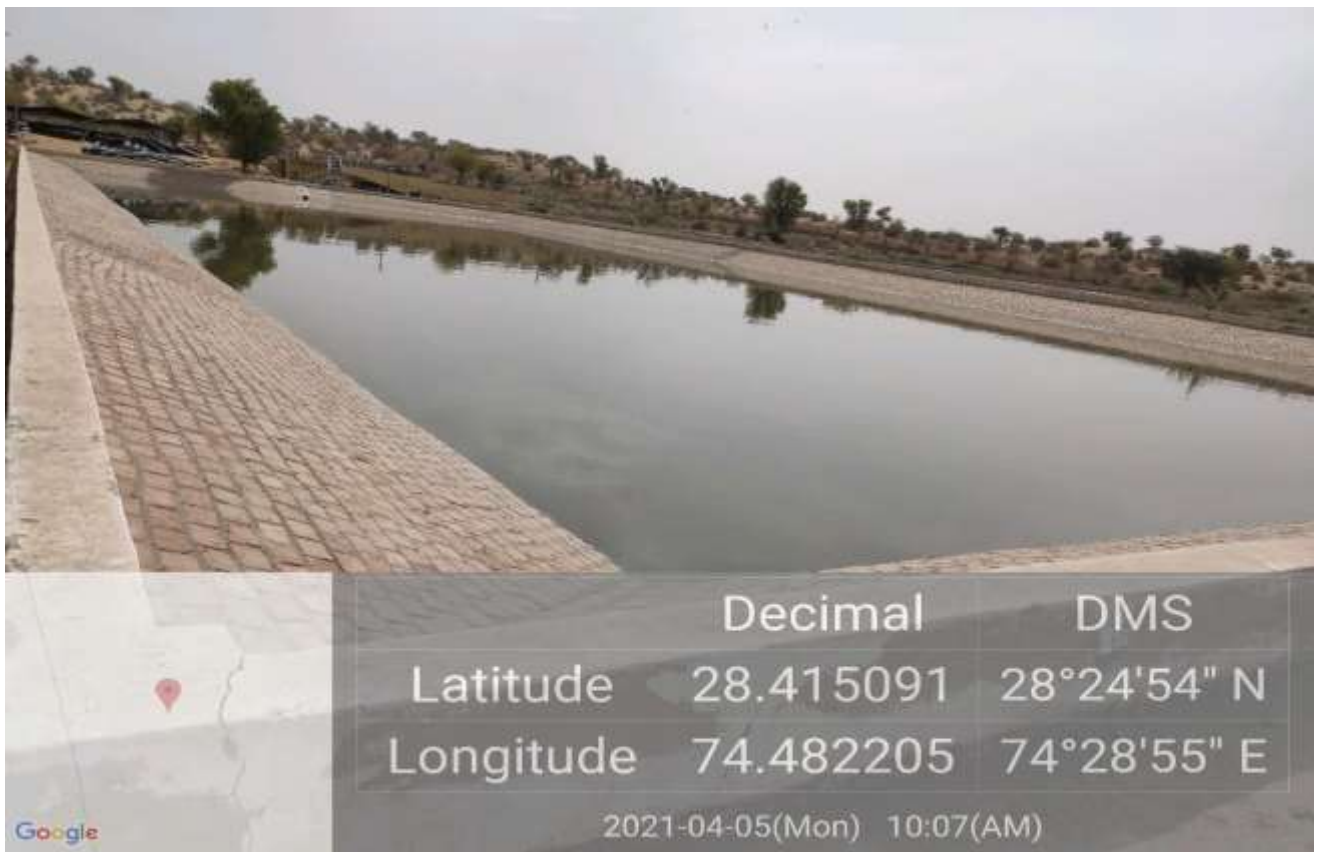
B: Existing STP located on Bikaner road, Sardarsahar (Capacity of plant is 5.0 MLD)
